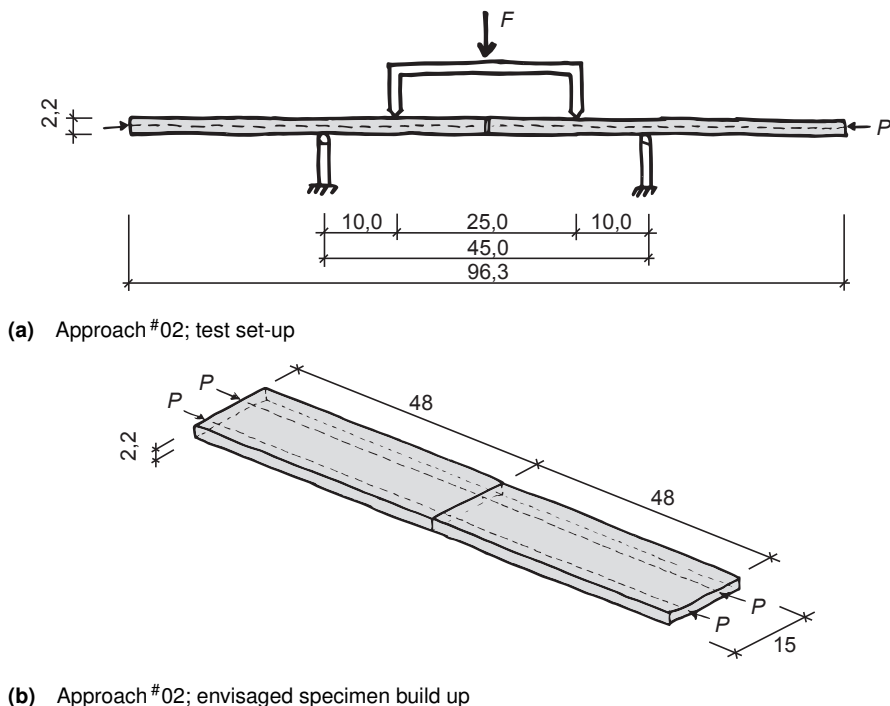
Approach #02; test set-up for prestressed connection [cm]
